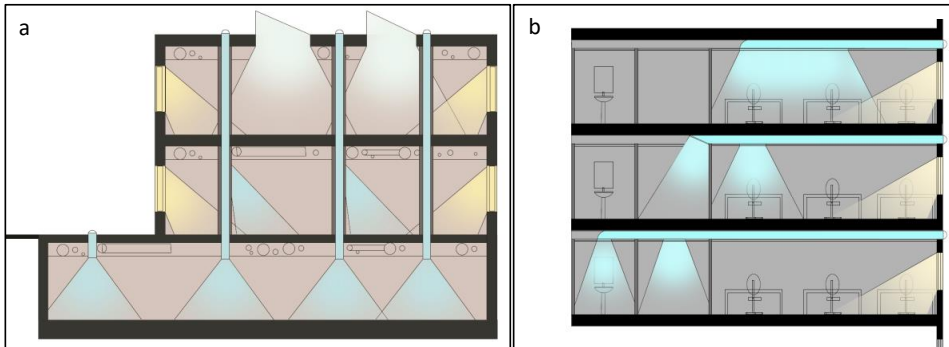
illustration of light pipe application in high latitude areas with predominantly overcast sky and low altitude sun. a) Vertical light pipes are suitable for low compact buildings. b) Horizontal light pipes are suitable for a south façade for multilevel buildings²¹.
